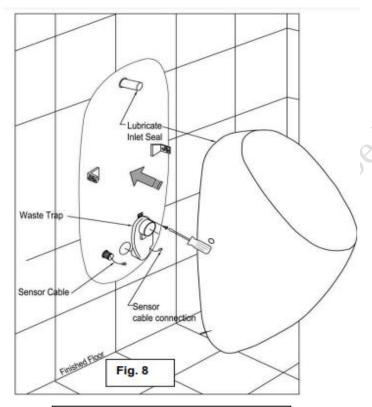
Fixing waste trap to wall  $\,$
